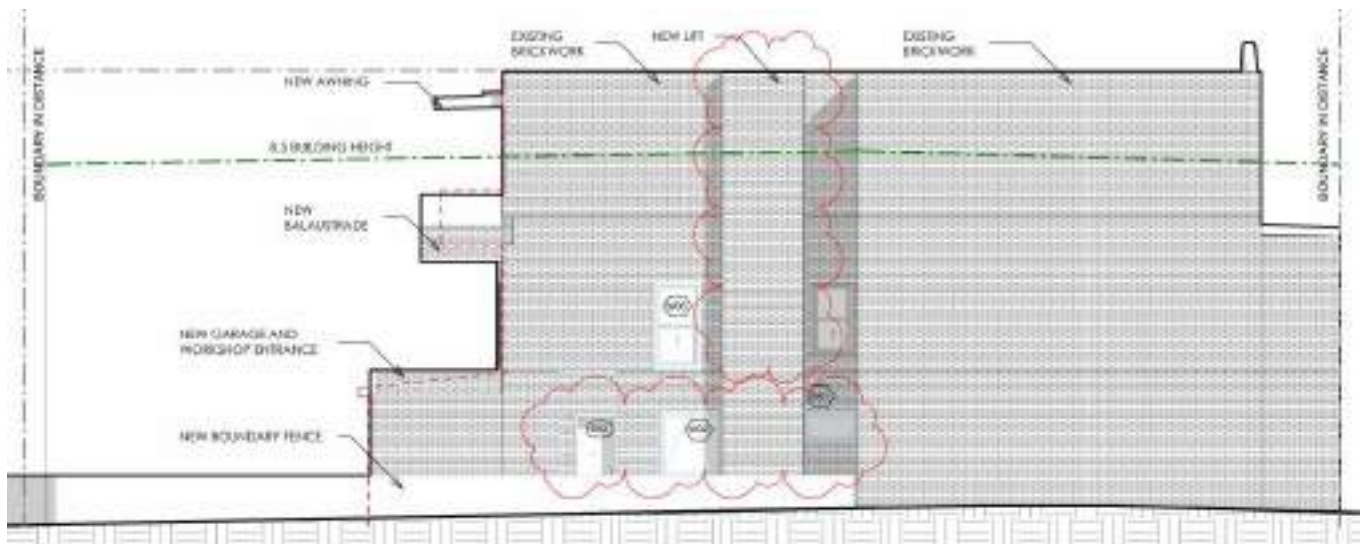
Northern elevation showing position of lift, re-aligned 450mm outwards from north wall
